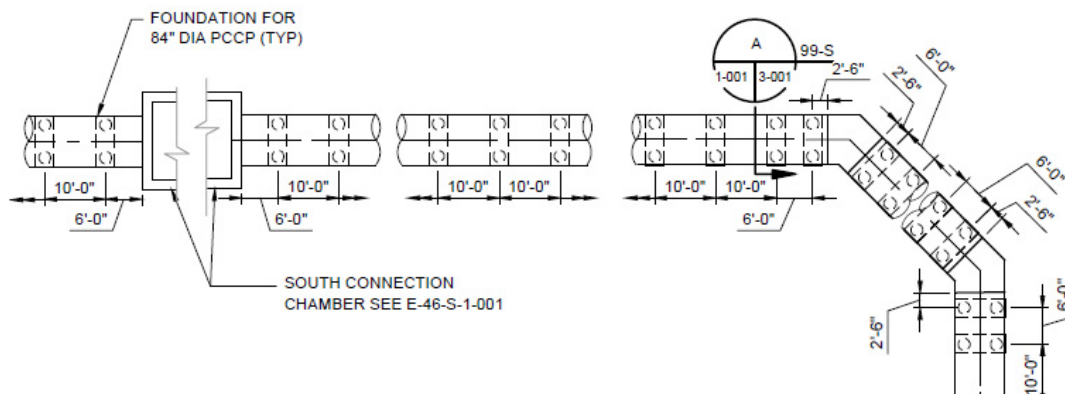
PCCP Secondary Effluent Conduit Foundation Layout
